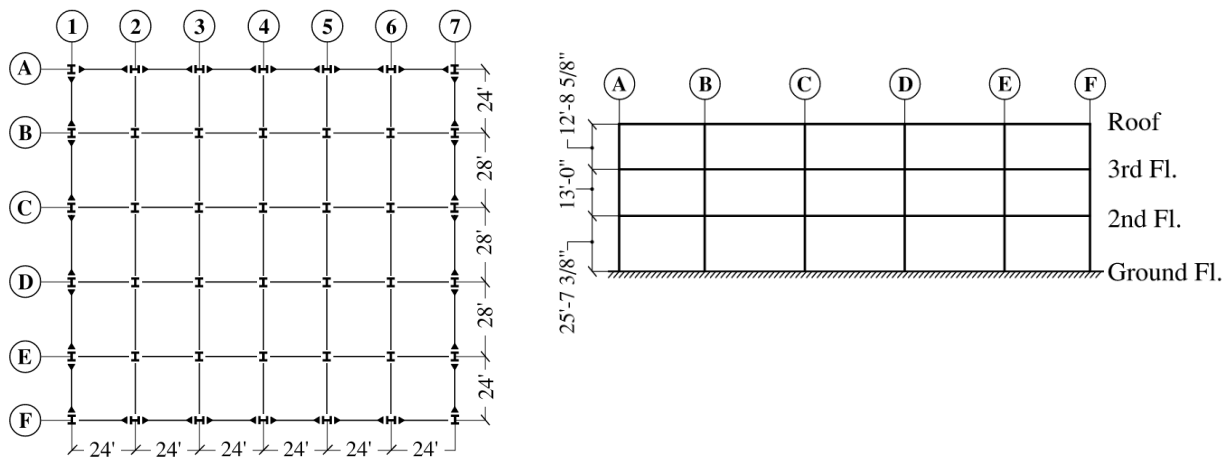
Plan view of building and elevation of perimeter frame on line 1
